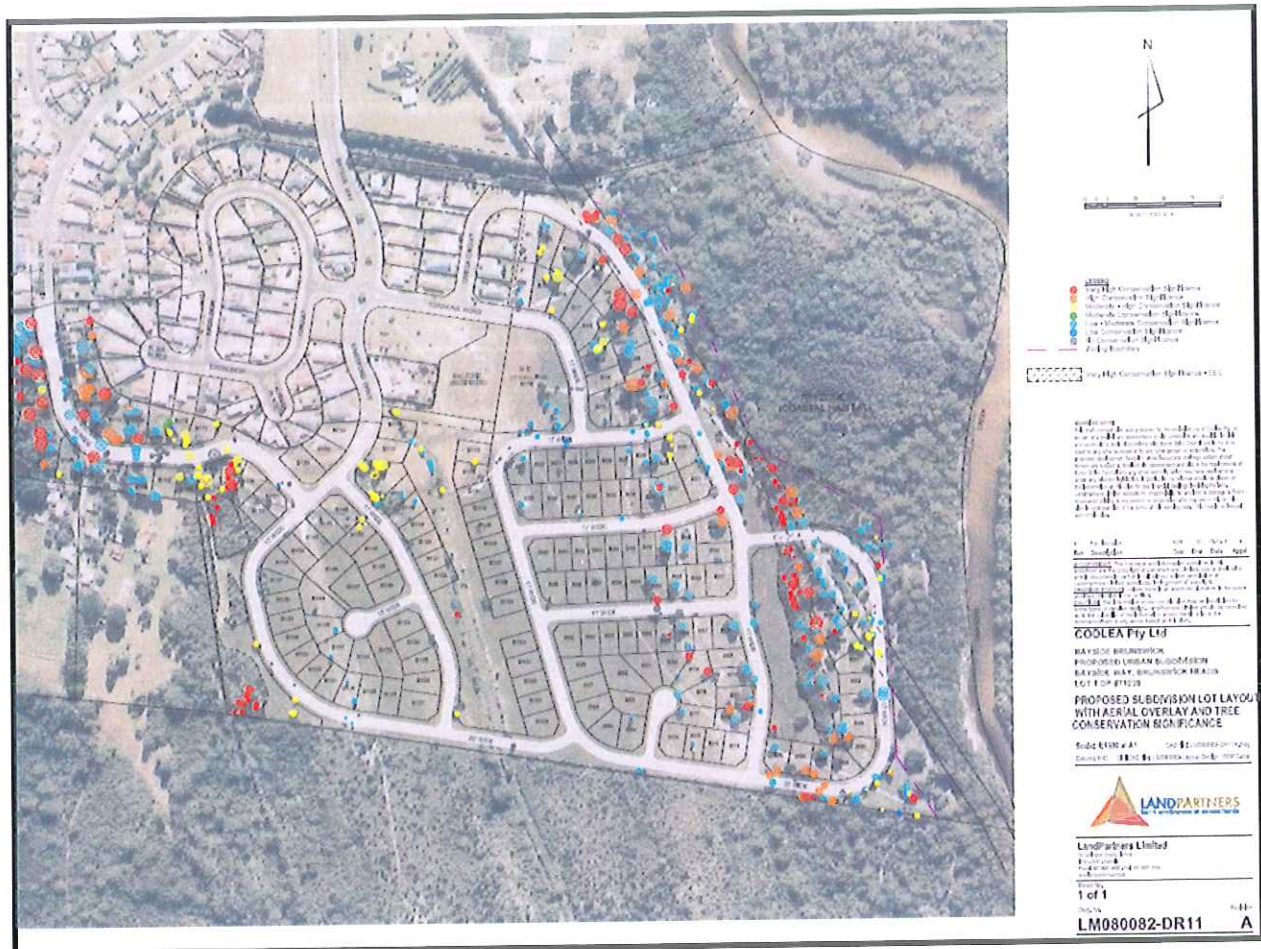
Final Proposed Layout Plans (image courtesy of LandPartners)
